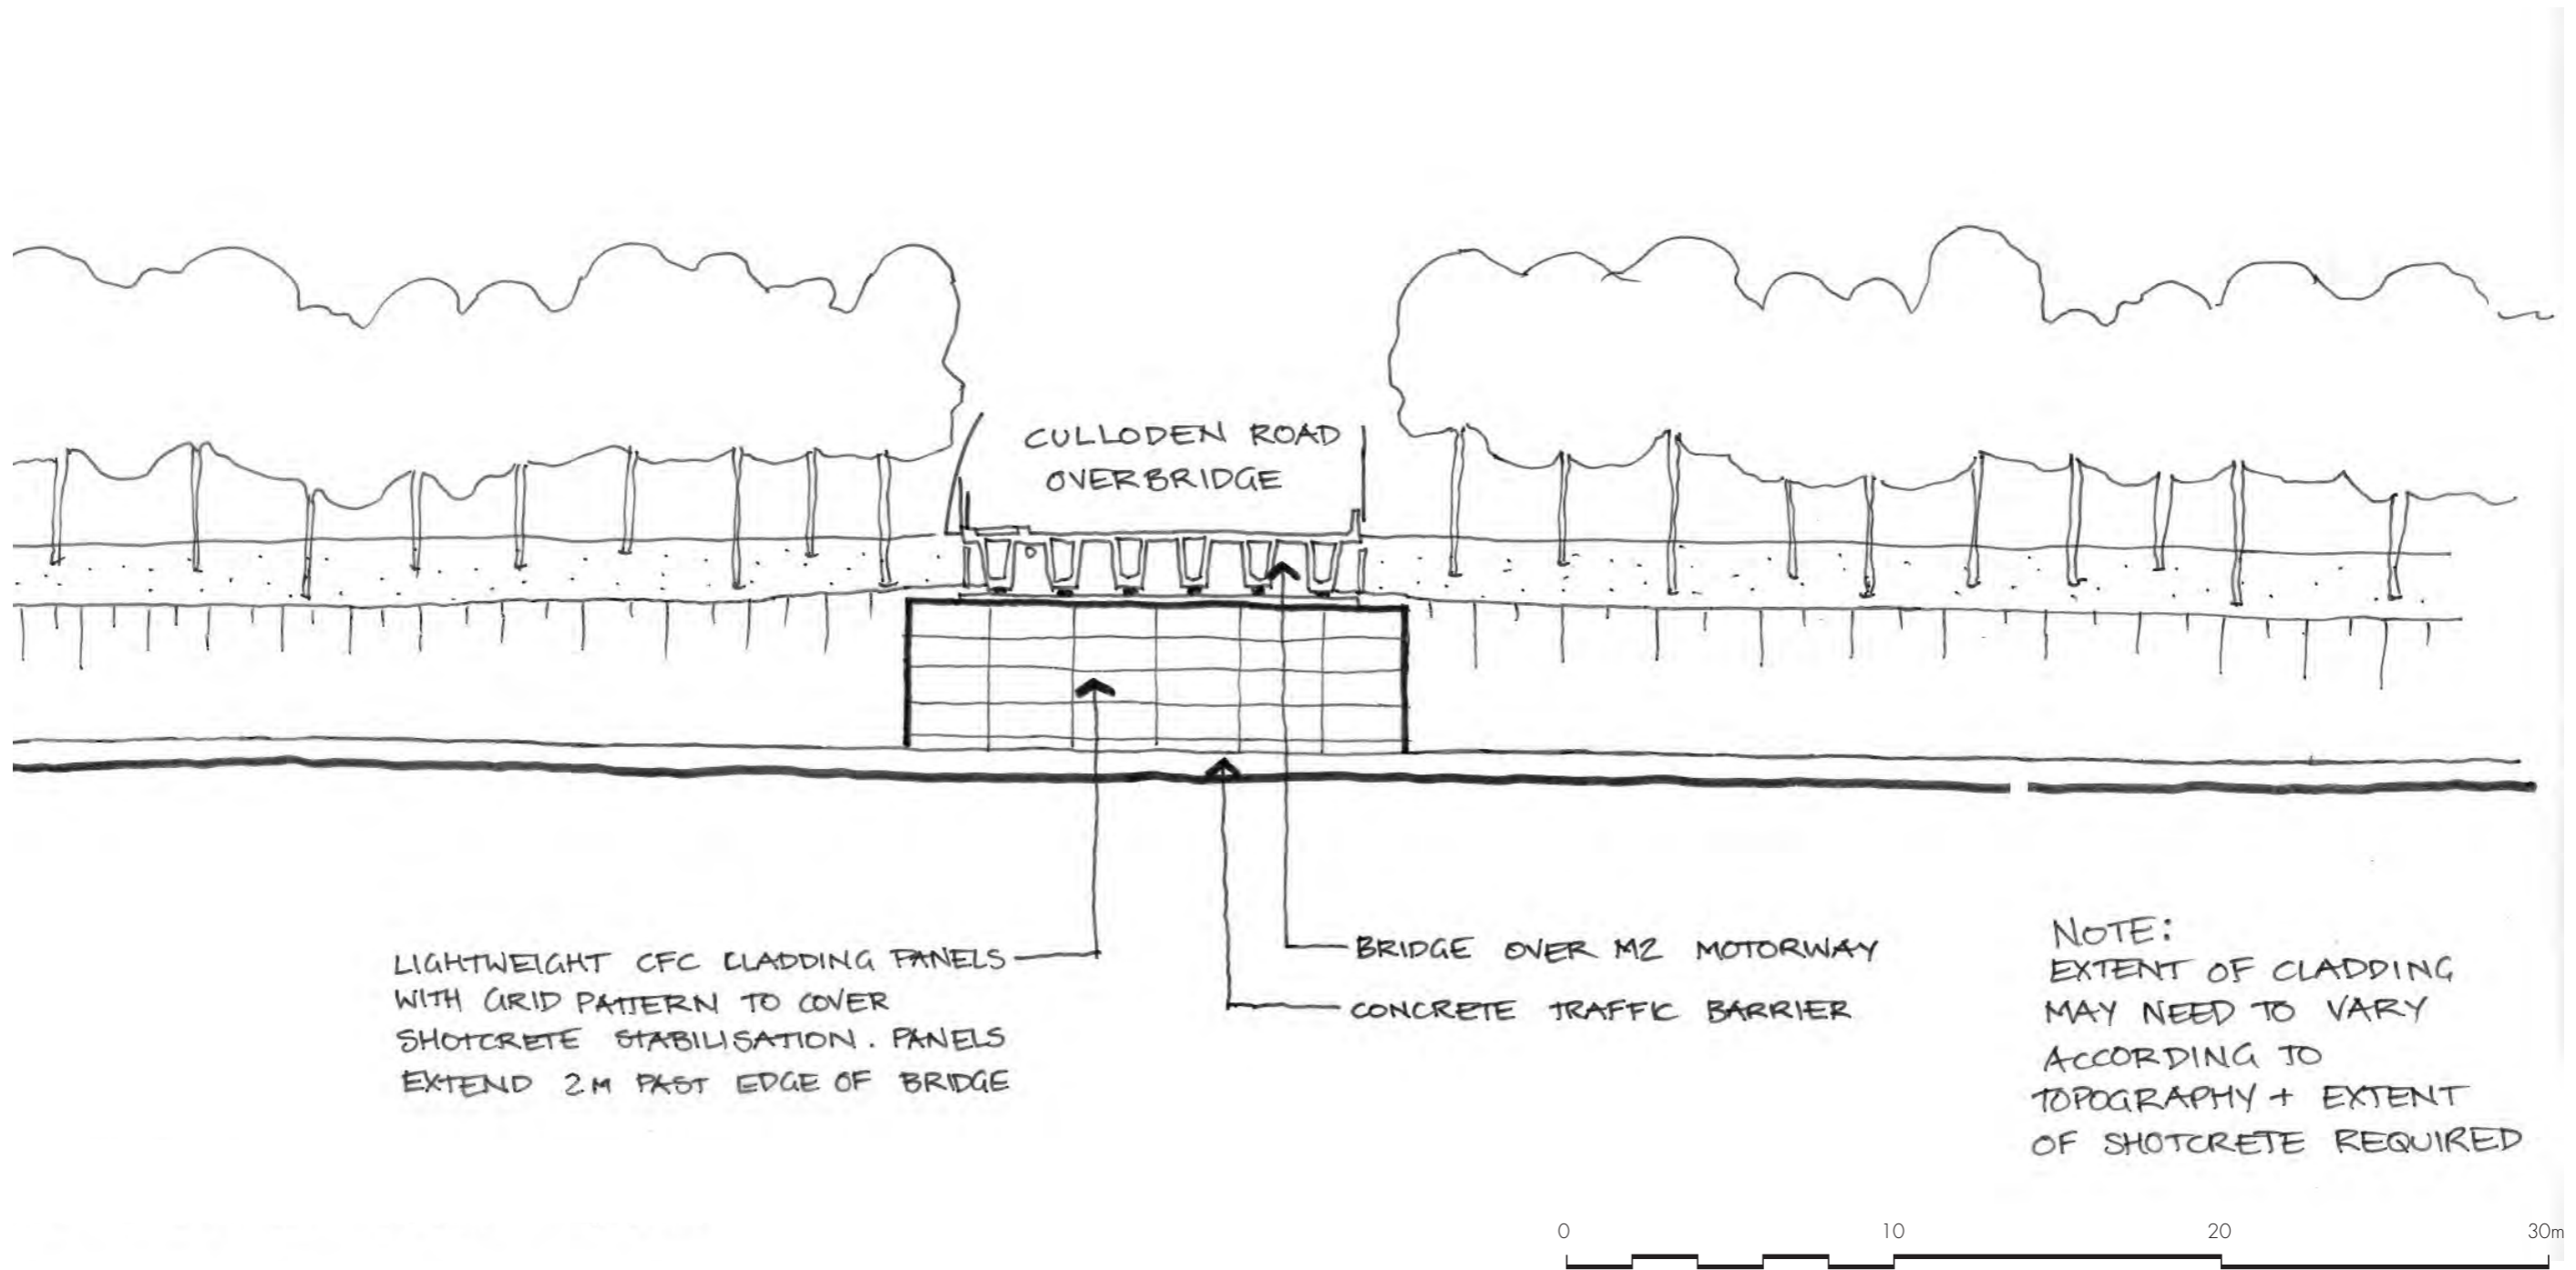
Type C retaining walls - Compressed Fibre Cement Cladding Panels at Culloden and Christie Road Overbridges
